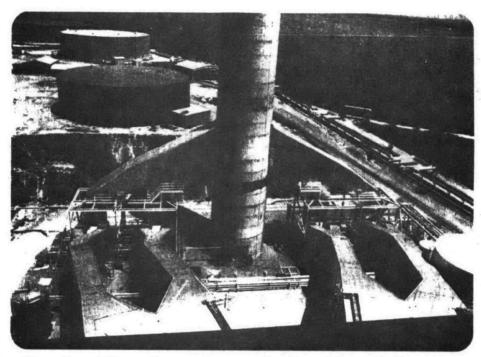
View from the roof of Boiler 5 facing north showing Boiler 5 duct tie-ins to the stack. Oil storage tanks are shown in the background.
